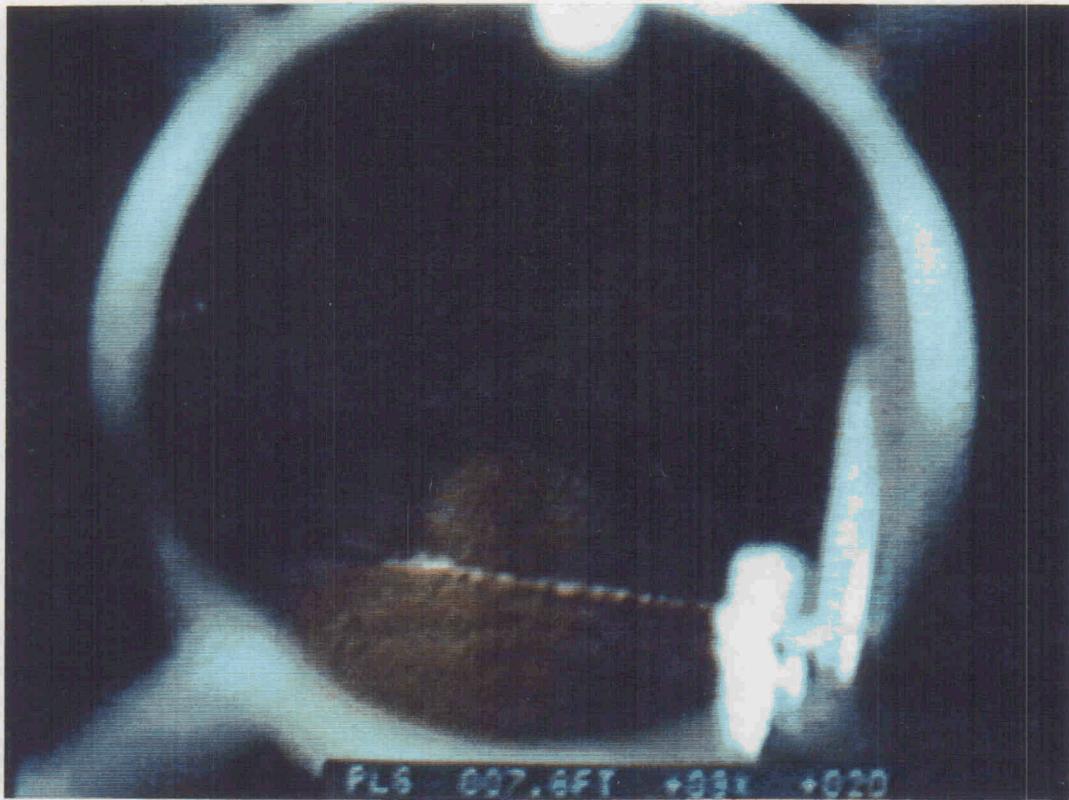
Welded seam on duct corner in Sect. 3.
